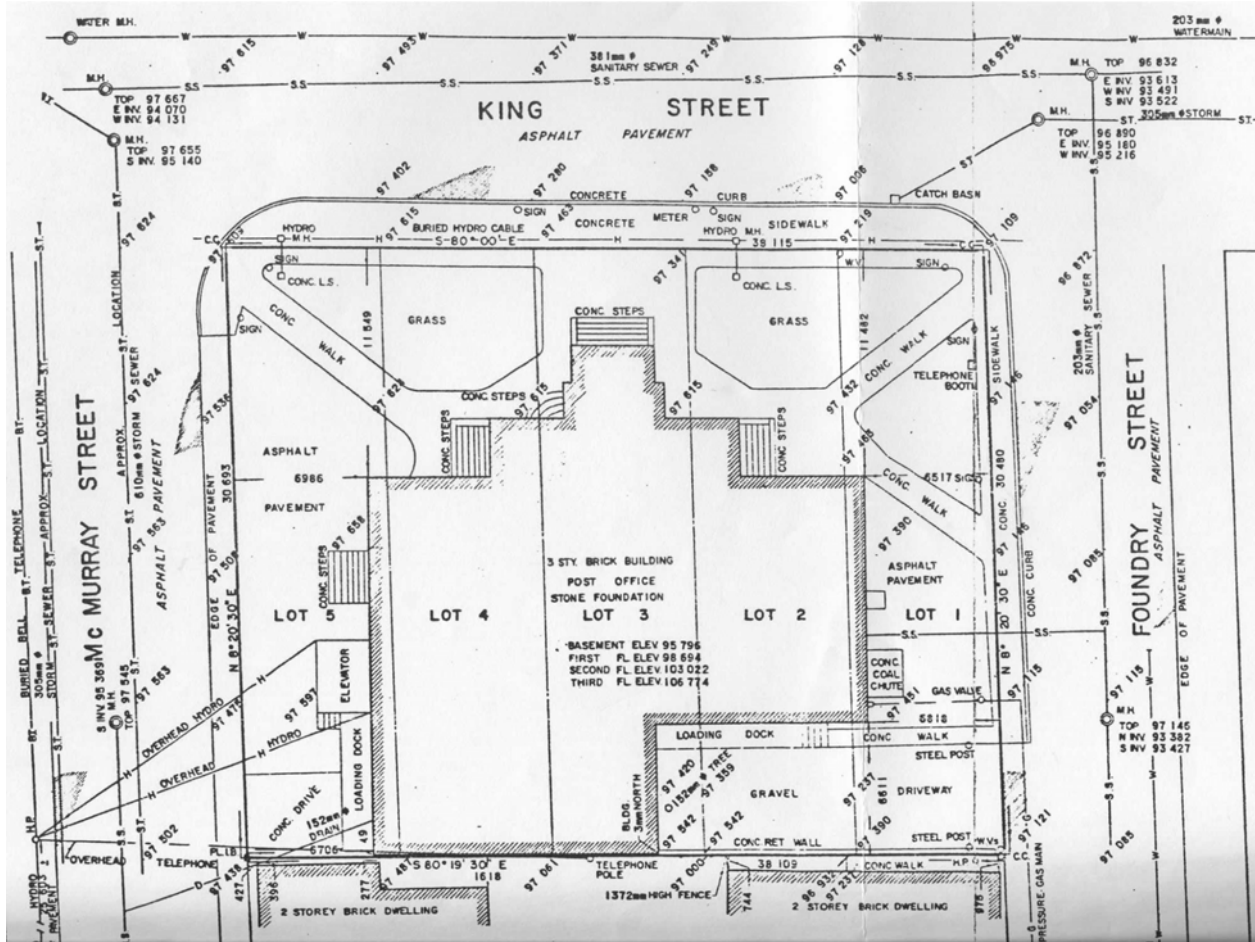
1978 Topographical Survey Plan showing the original landscaping plan with the diagonal concrete walkways and areas of grass, two of which had by then been replaced with asphalt pavement.
